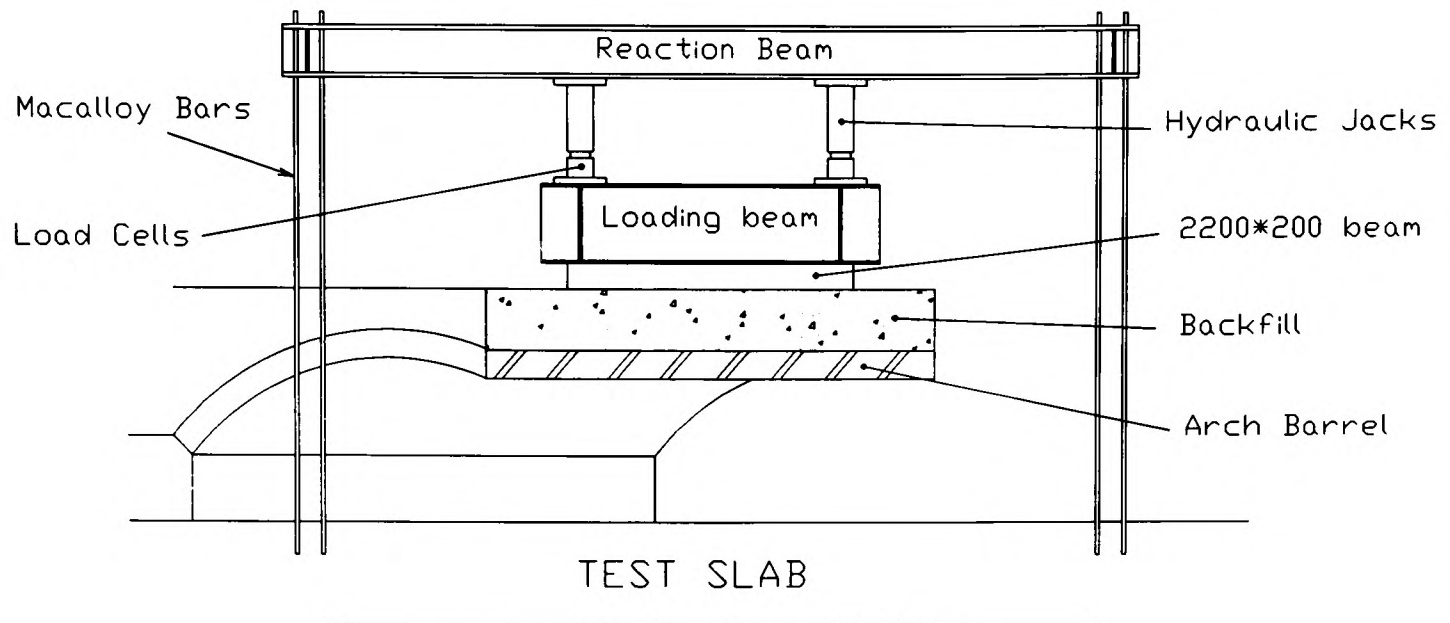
Loading arrangement for the 3.0 m span model arch bridges
